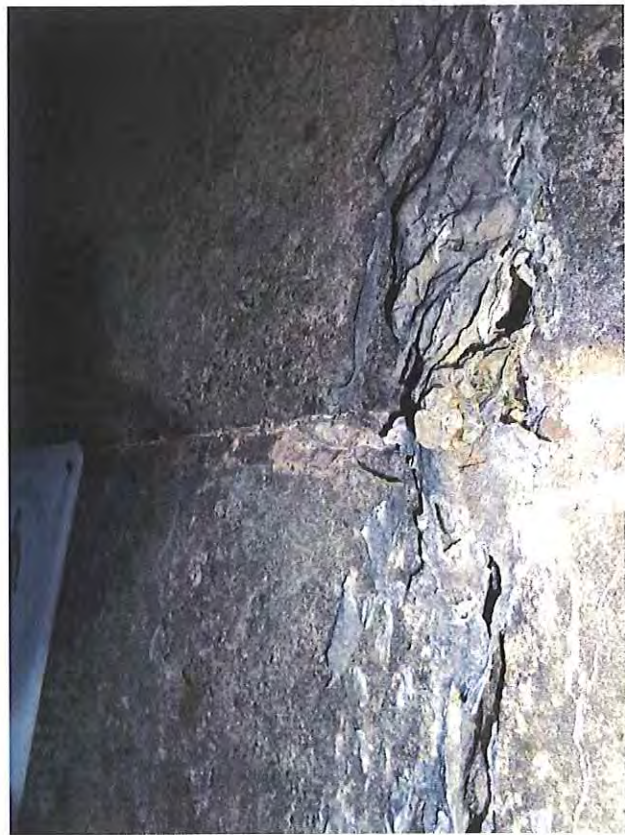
DEFECT: - Wingwall – Efflorescence
